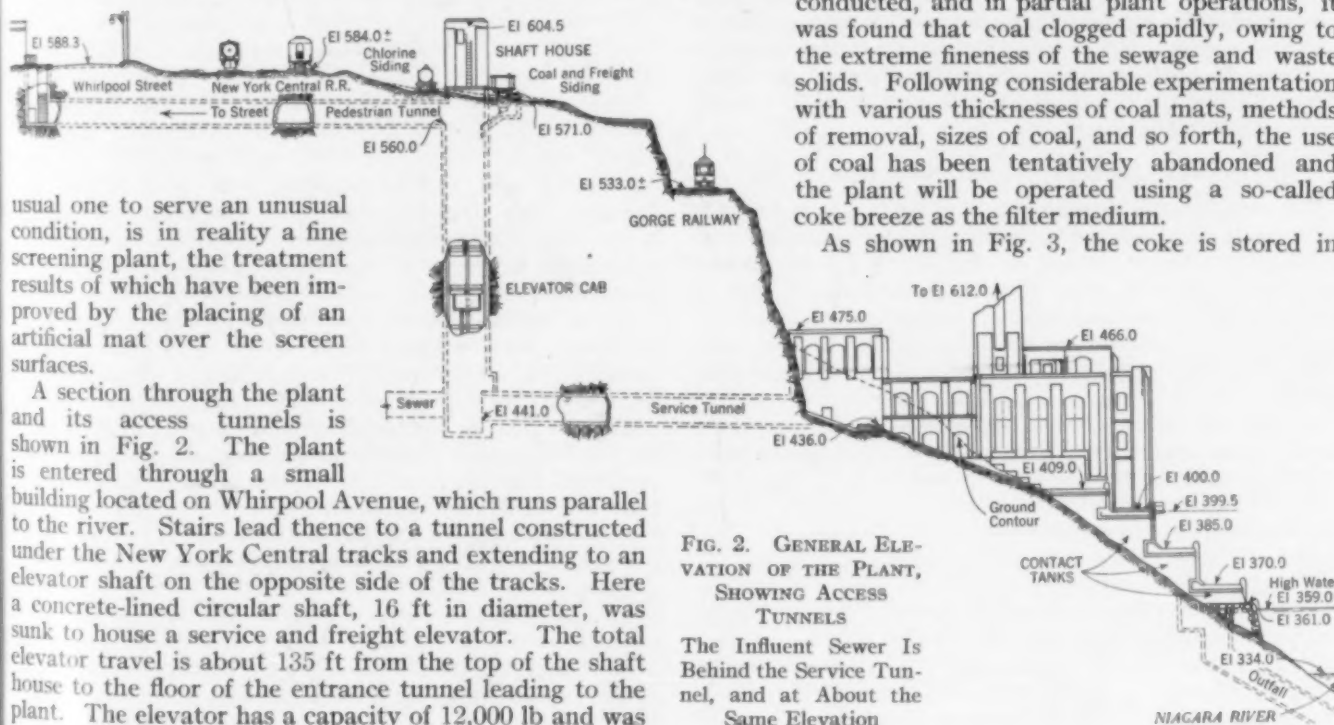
GENERAL ELEVATION OF THE PLANT, SHOWING ACCESS TUNNELS
